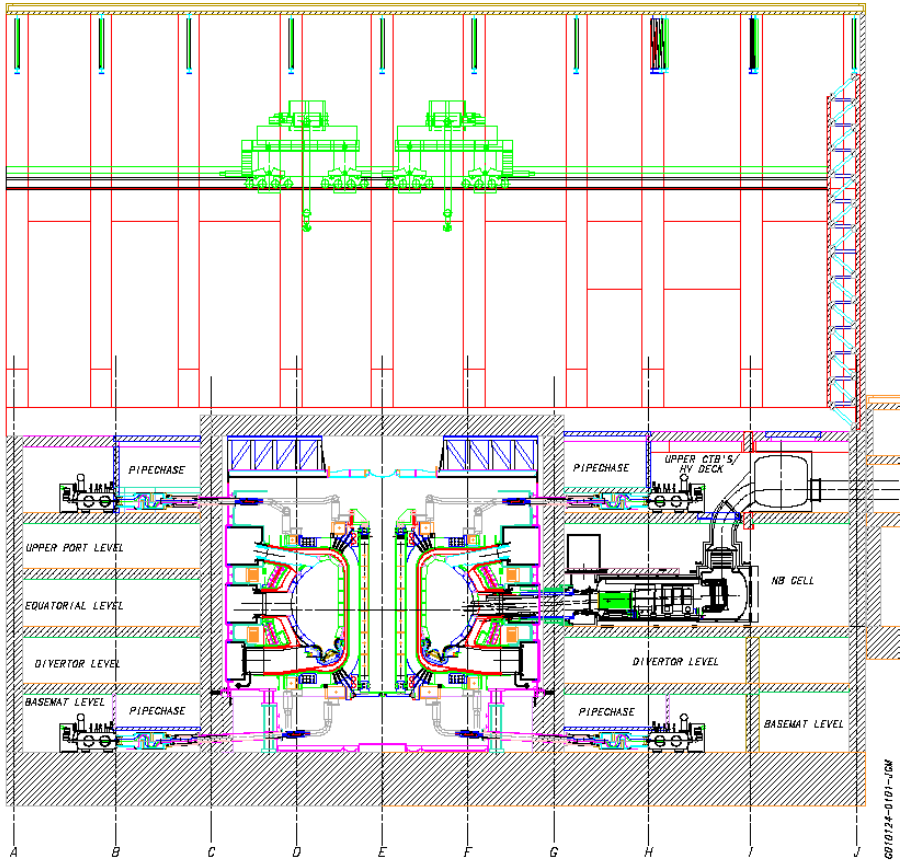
Cross-section NS Through the Tokamak Building
